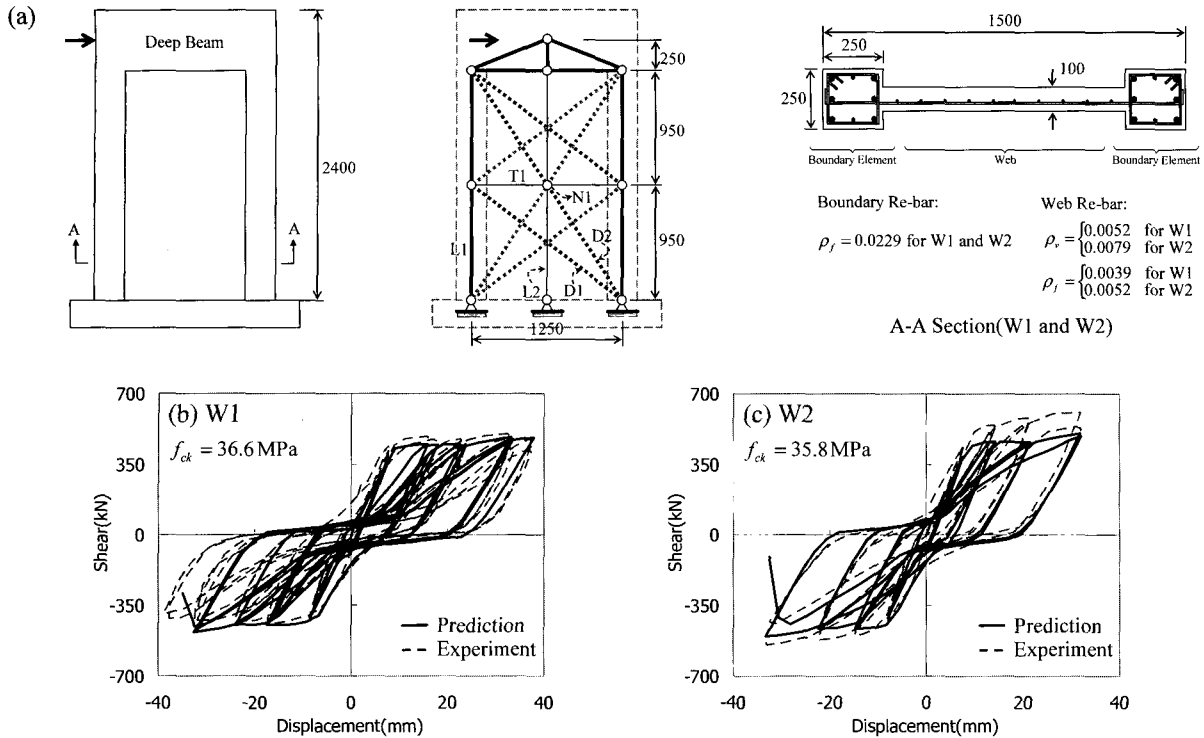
Predictions for short shear walls²⁸⁾: (a) Details and analytical truss model, (b) W1 and (c) W2
